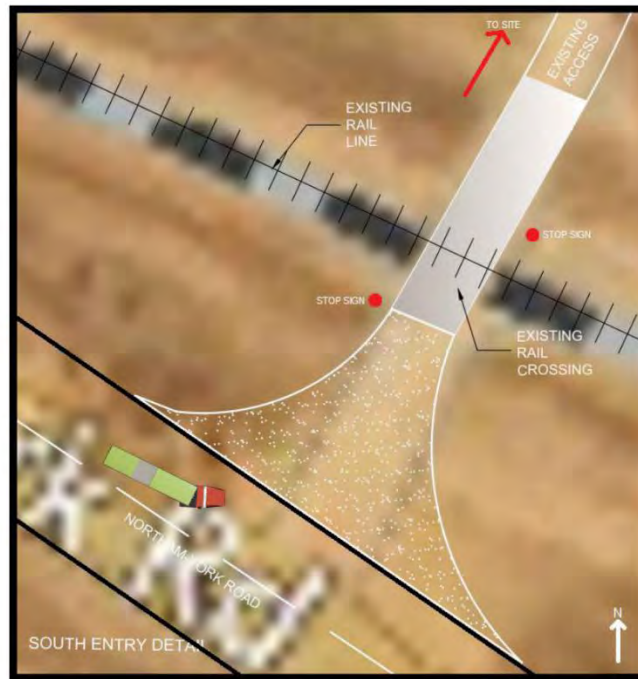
South Entrance Rail Crossing and Access Turn-off Detail
